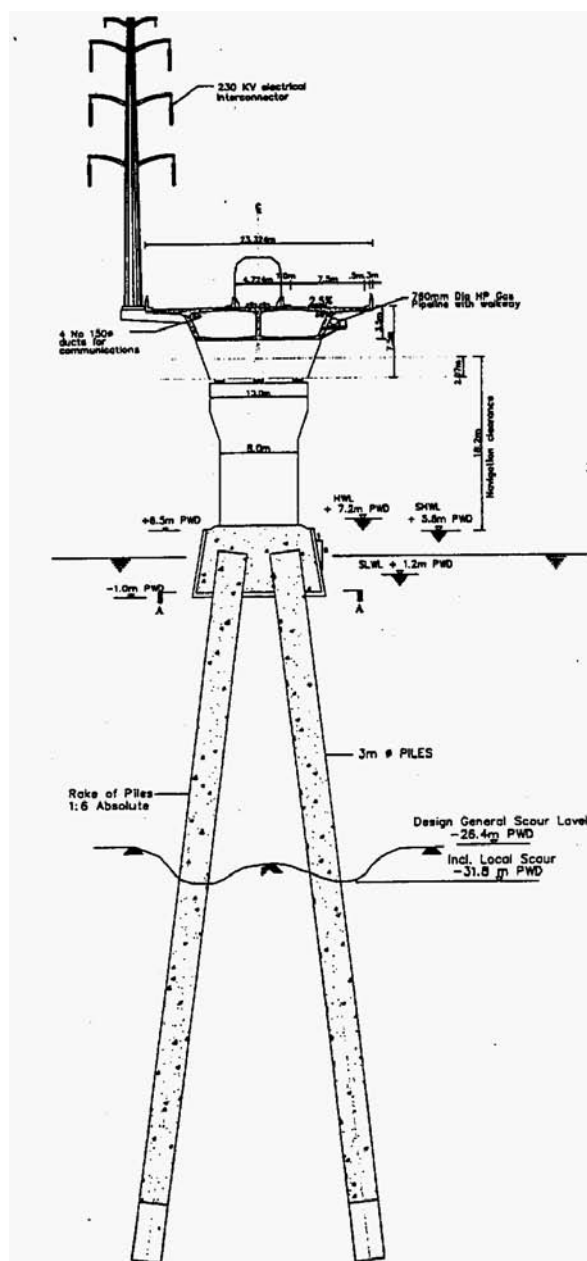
(c) Padma Bridge at Mawa (Pre-F/S): Substructure and Foundation
